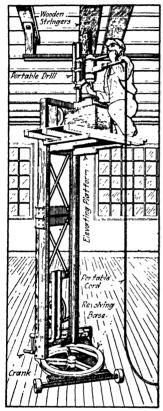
Drilling holes in overhead wooden stringer with an electric drill and a tiering machine employed as a support. (Revolvator Co., Jersey City, N. J.)
